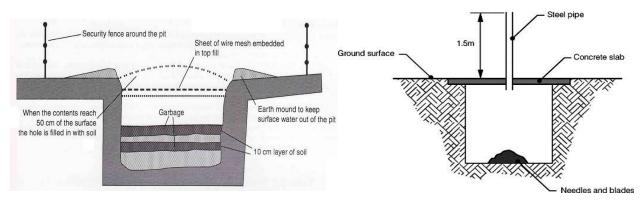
Cross Section of Secured Landfill/ Deep Burial Pit (left diagram) and Sharp Waste Disposal Pit
